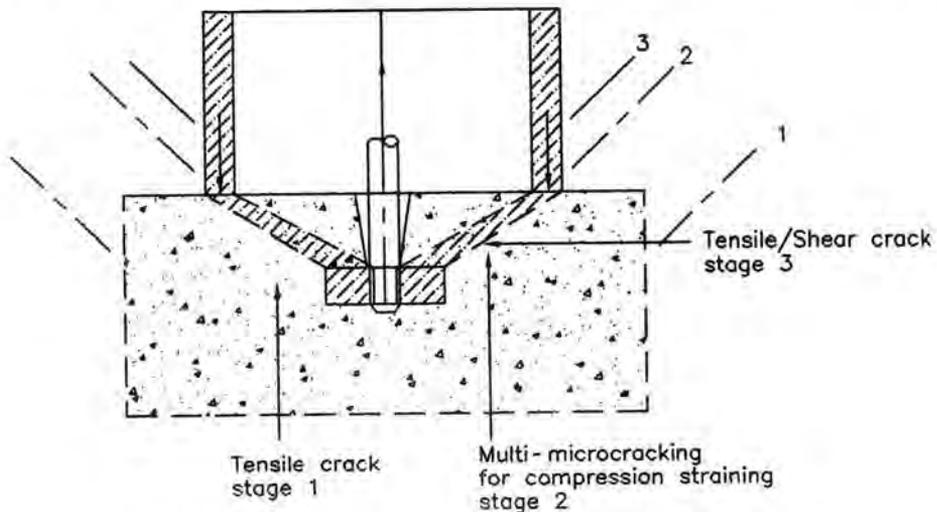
Internal Cracking Stages during a Pull-out¹⁵³
